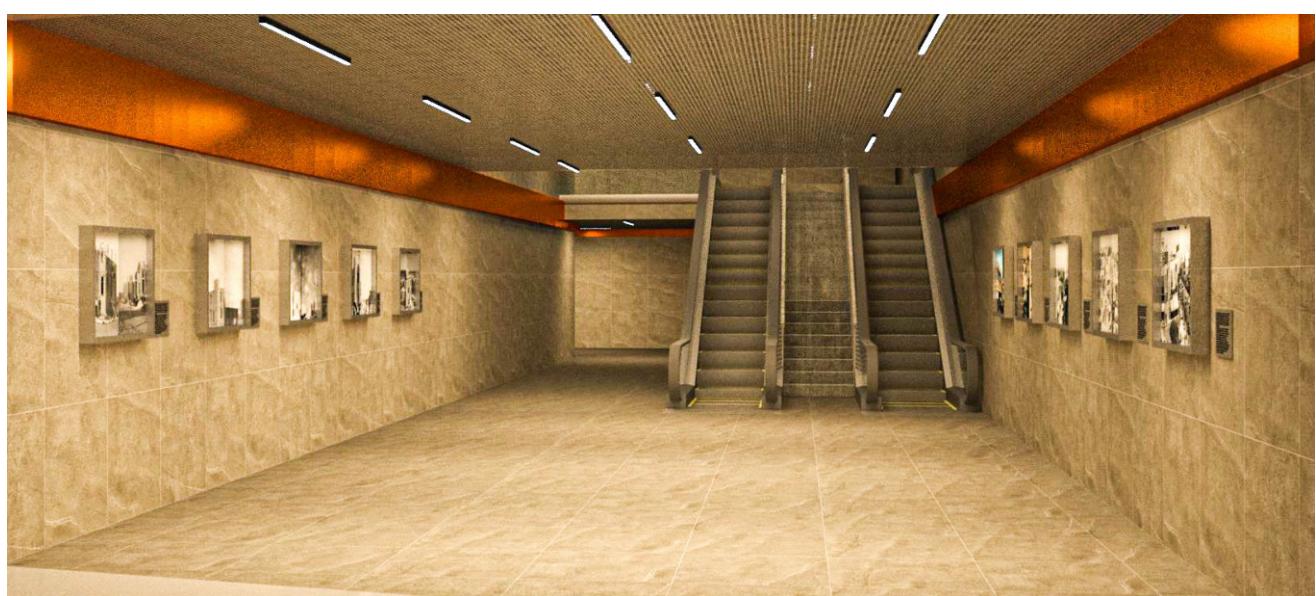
Magen David Metro Station, ticketing level, exit B to Honigmann House.
